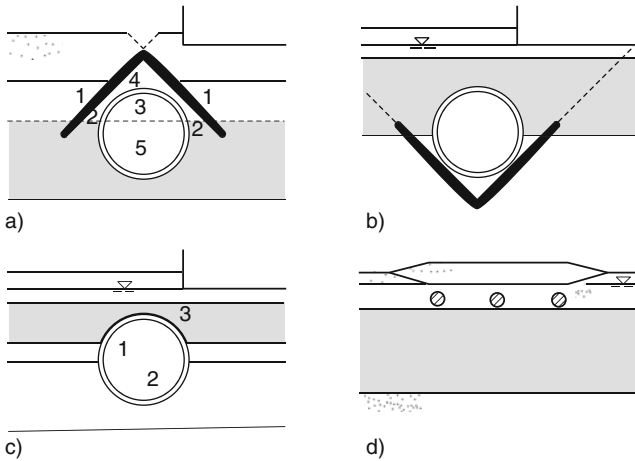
Cavities in composite ground: roof (a) and inverted roof (b) against groundwater, tunnel with roof grouting (c), compensation grouting under a dam (d). Numbers for the succession
